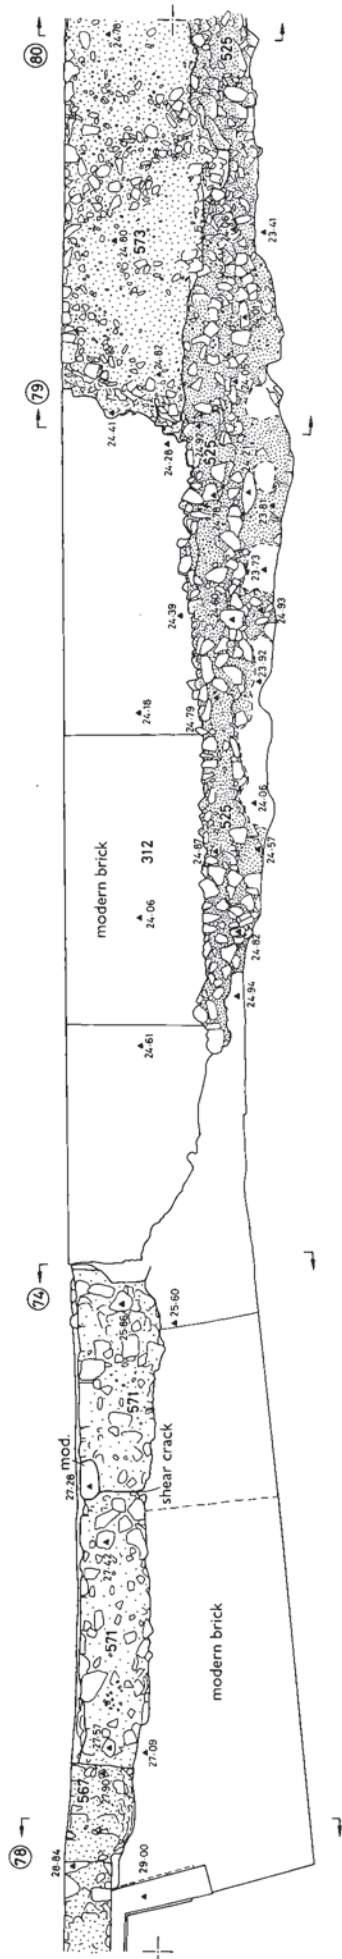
Western Way-Watgate plan, internal elevation C Scale 1:100.
